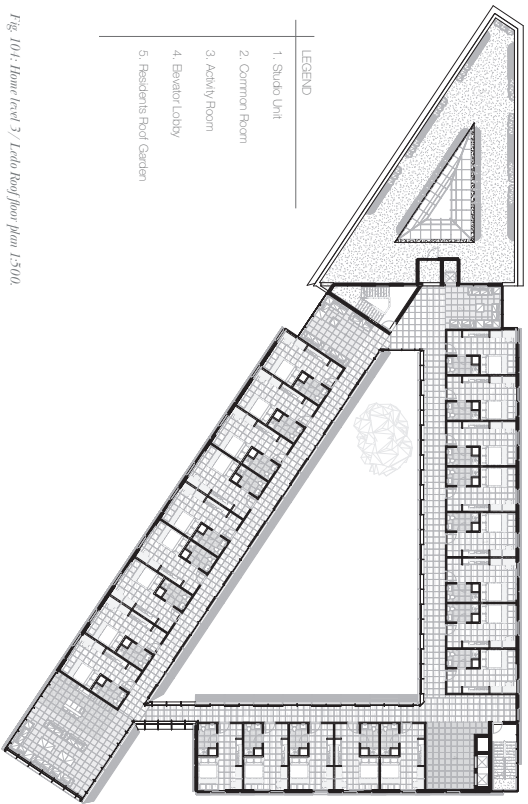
3rd / Ledo Roof floor plan 1:500.
